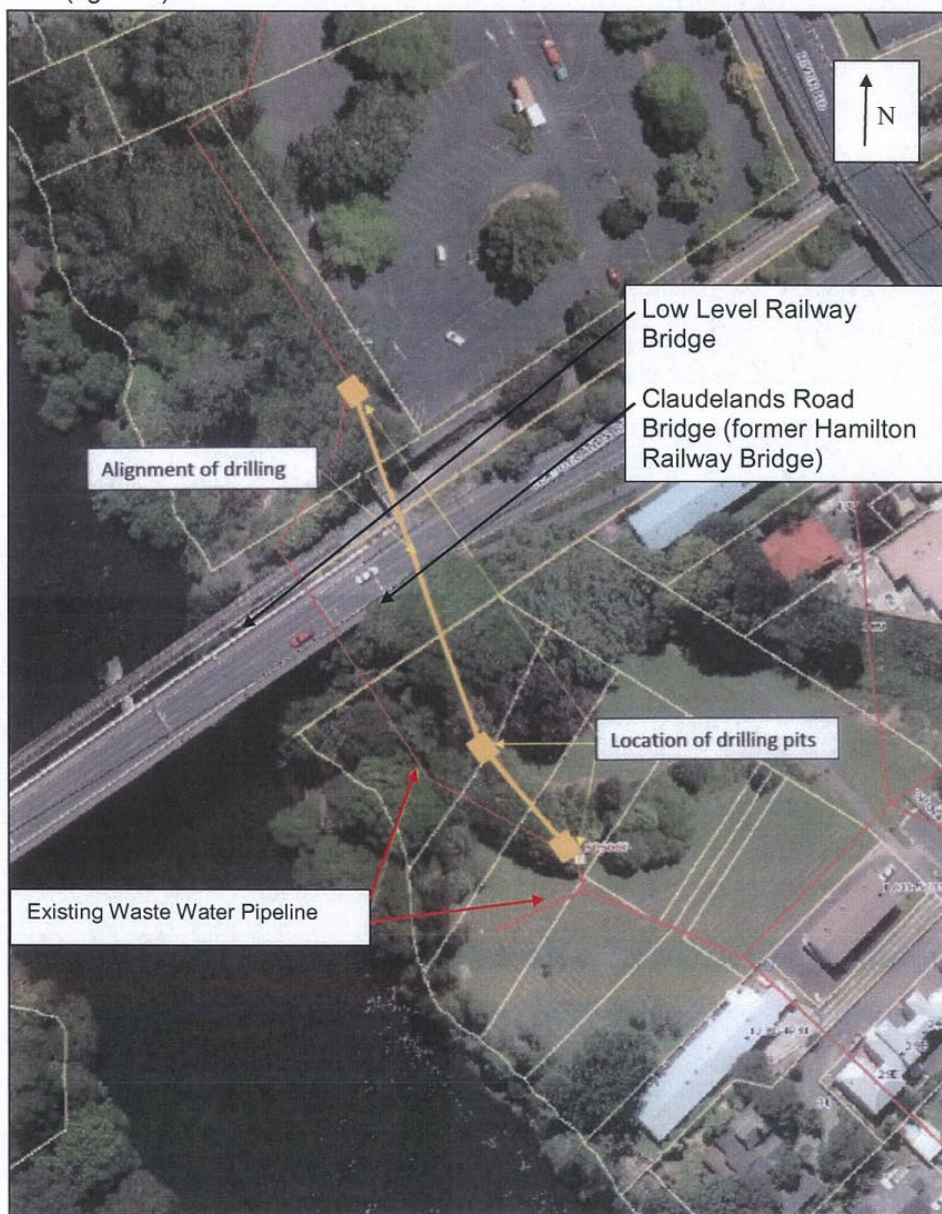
WASTE WATER PIPE LINE OPTION A
